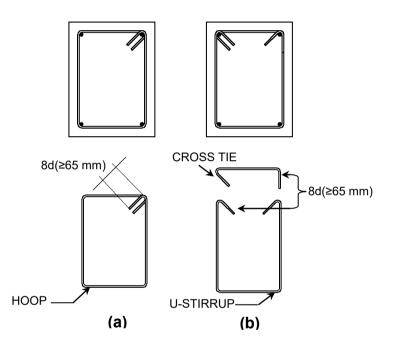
DETAILS OF HOOKS OF TRANSVERSE REINFORCEMENT IN BEAMS
